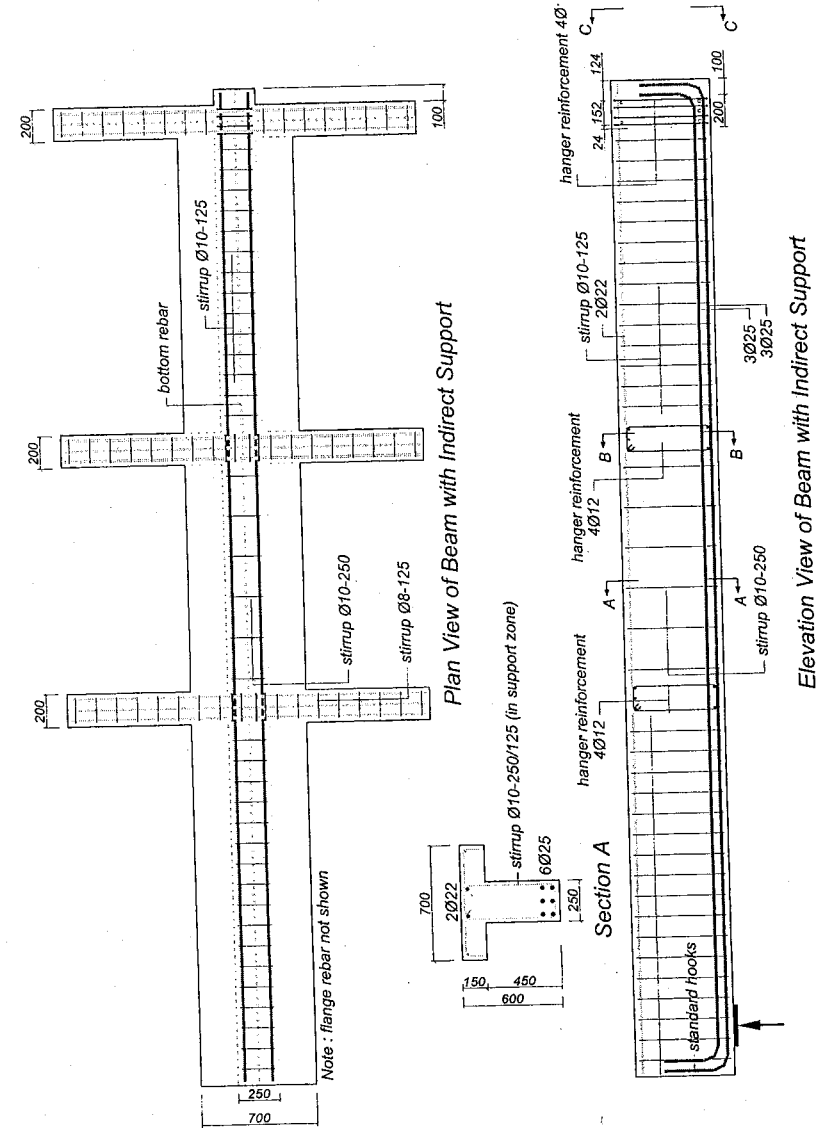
Elevation and section of beam with indirect support (1 mm = 0.03937 in)
